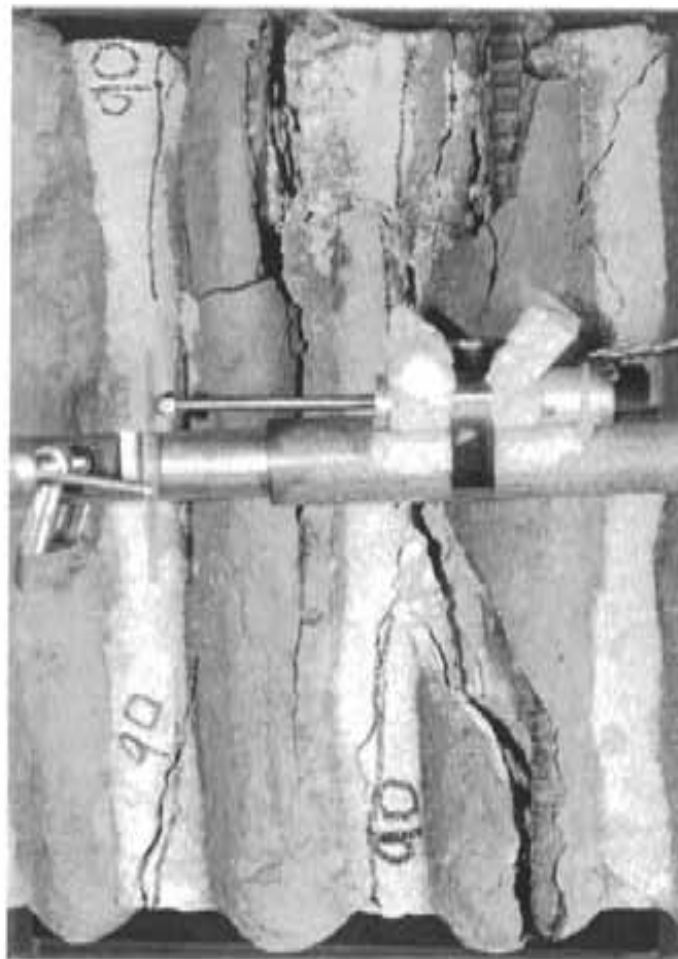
Column specimen U-ES3-PG-3 at failure
